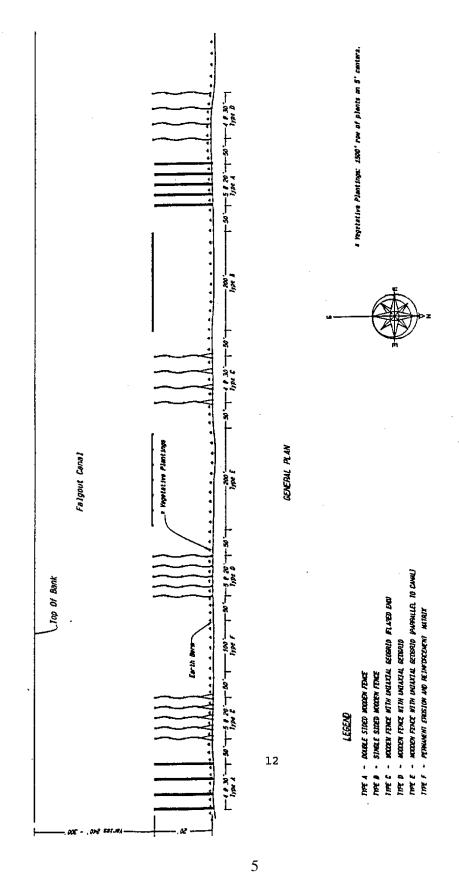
General plan of the Falgout Canal Plantings demonstration project.
